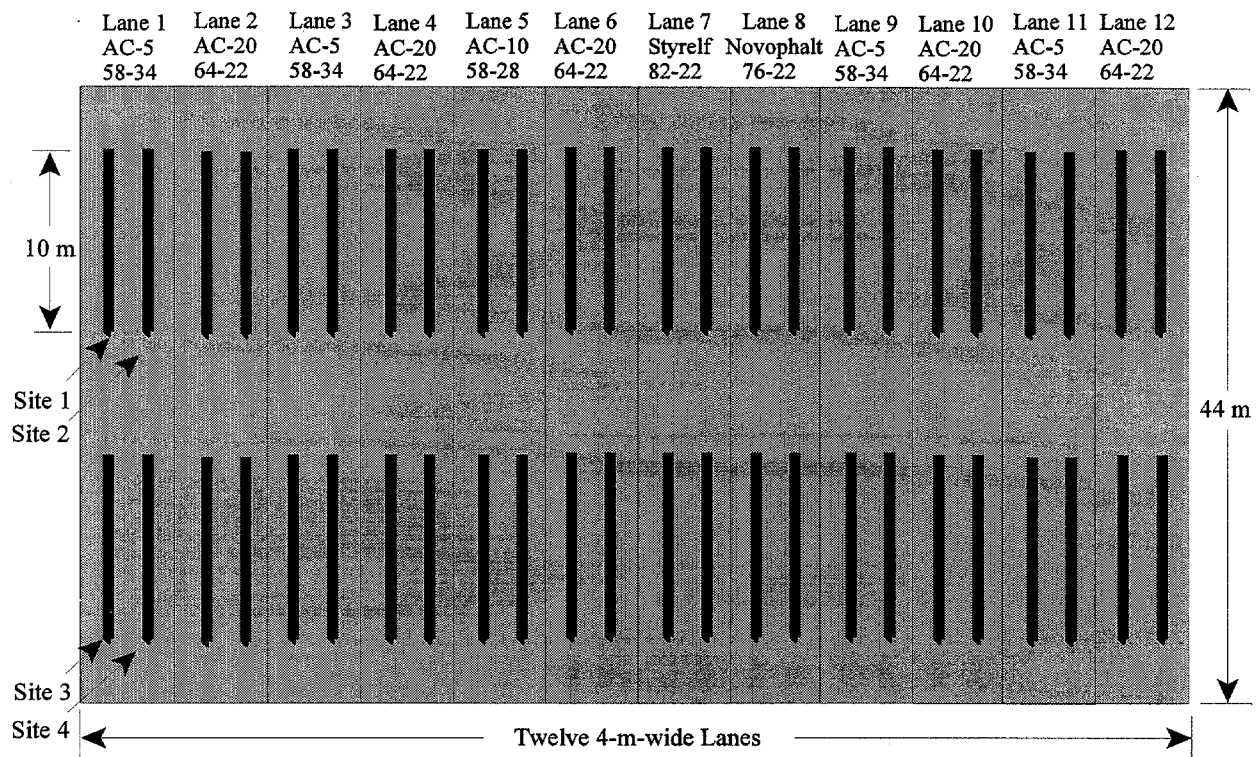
Layout of the test lanes at the FHWA Pavement Testing Facility.
